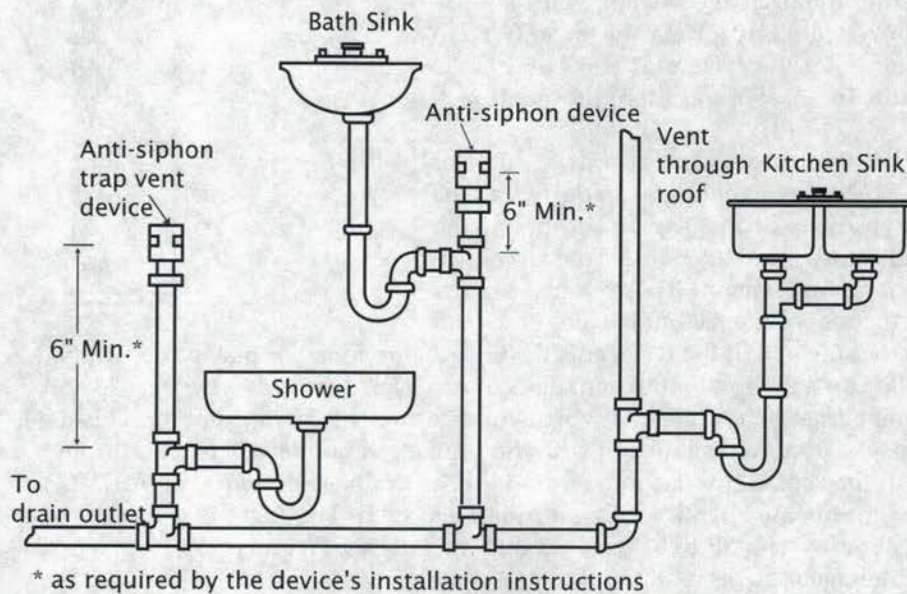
Methods of Venting (ASTVD, Roof Vent, and Connection with Vented Waste Line)
